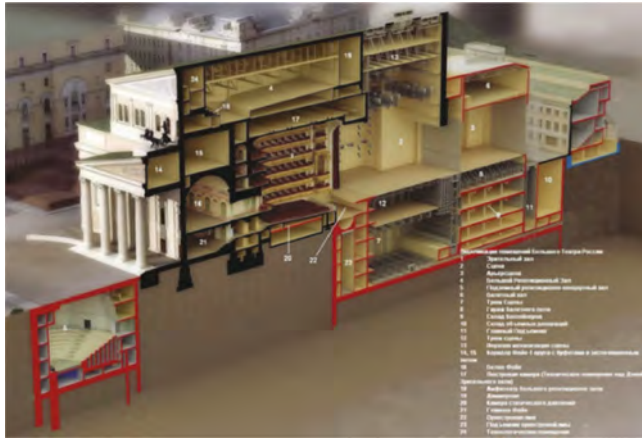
The concept of underground space of the Theatre Building, following the architect guru view.
